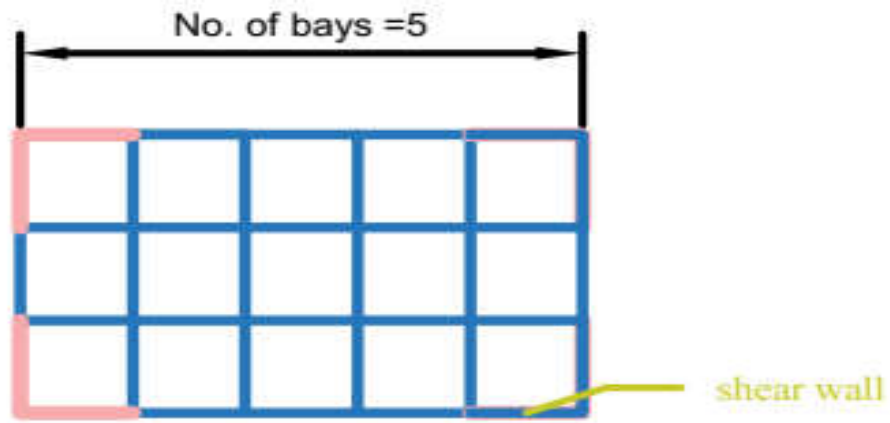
Plan of the Building (Shows the Location of the Shear Walls) Case 3.
